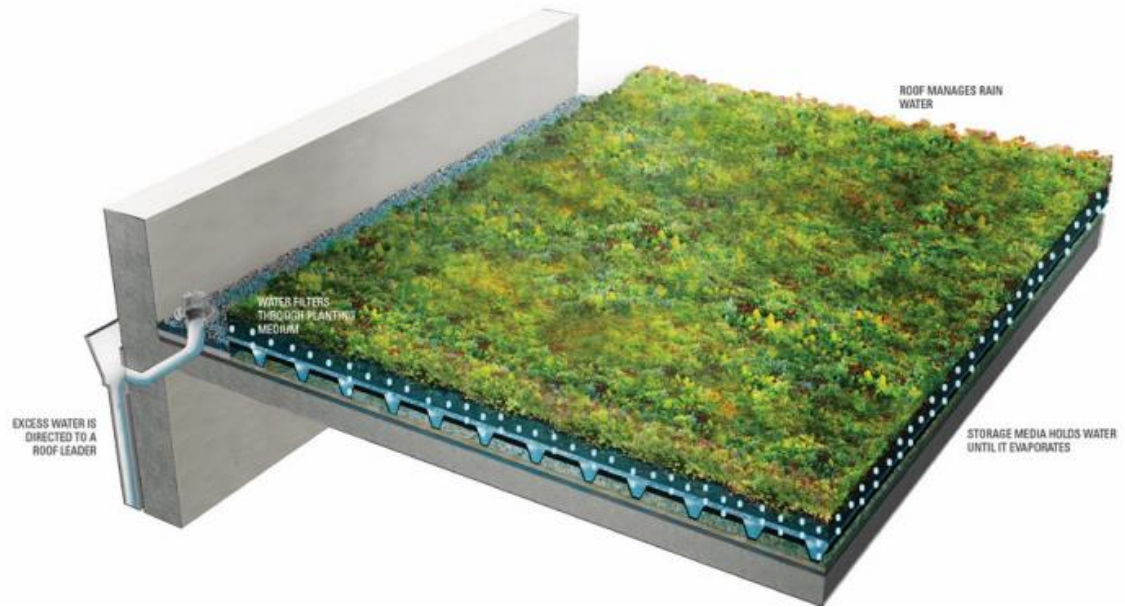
Layout of a green roof. Source: Philadelphia Water Department.
